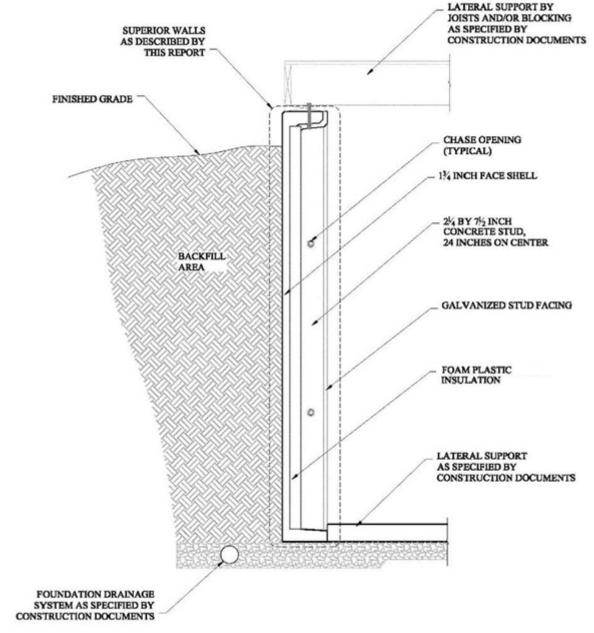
TYPICAL SUPERIOR WALL VERTICAL SECTION DETAIL
